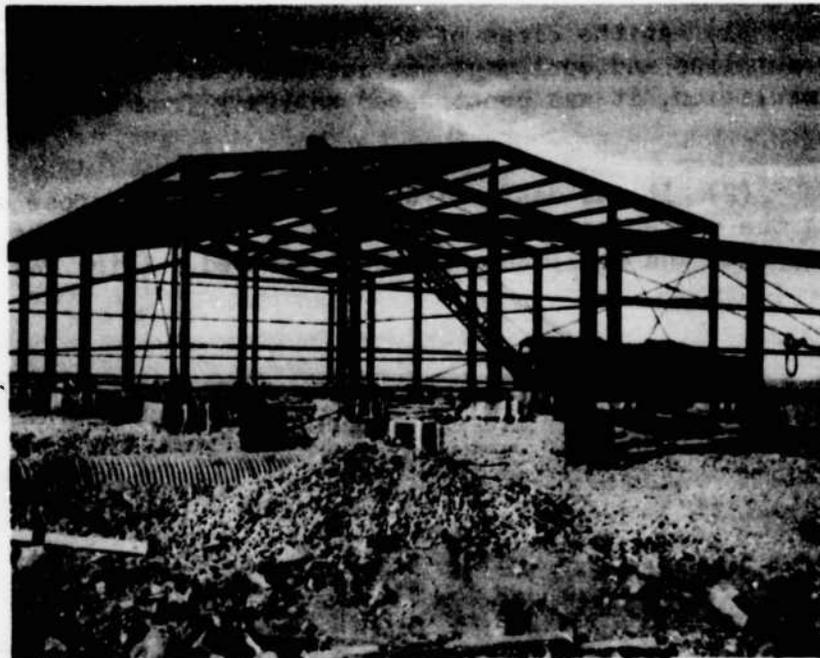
Frame of Modular Building Erected for Mess Hall and Kitchen
